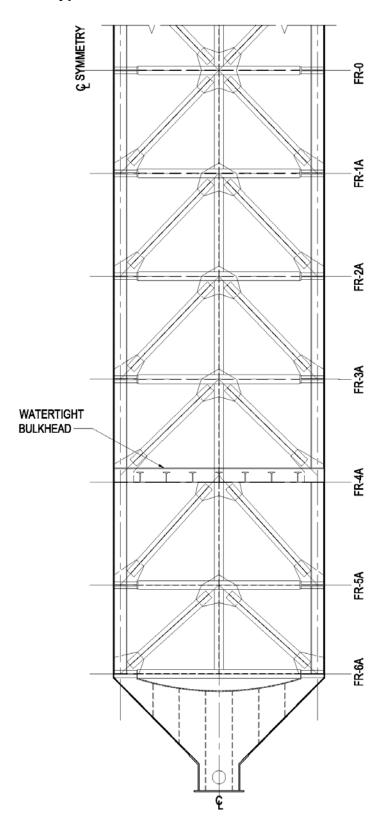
Typical Horizontal Girder for Welded Caisson
